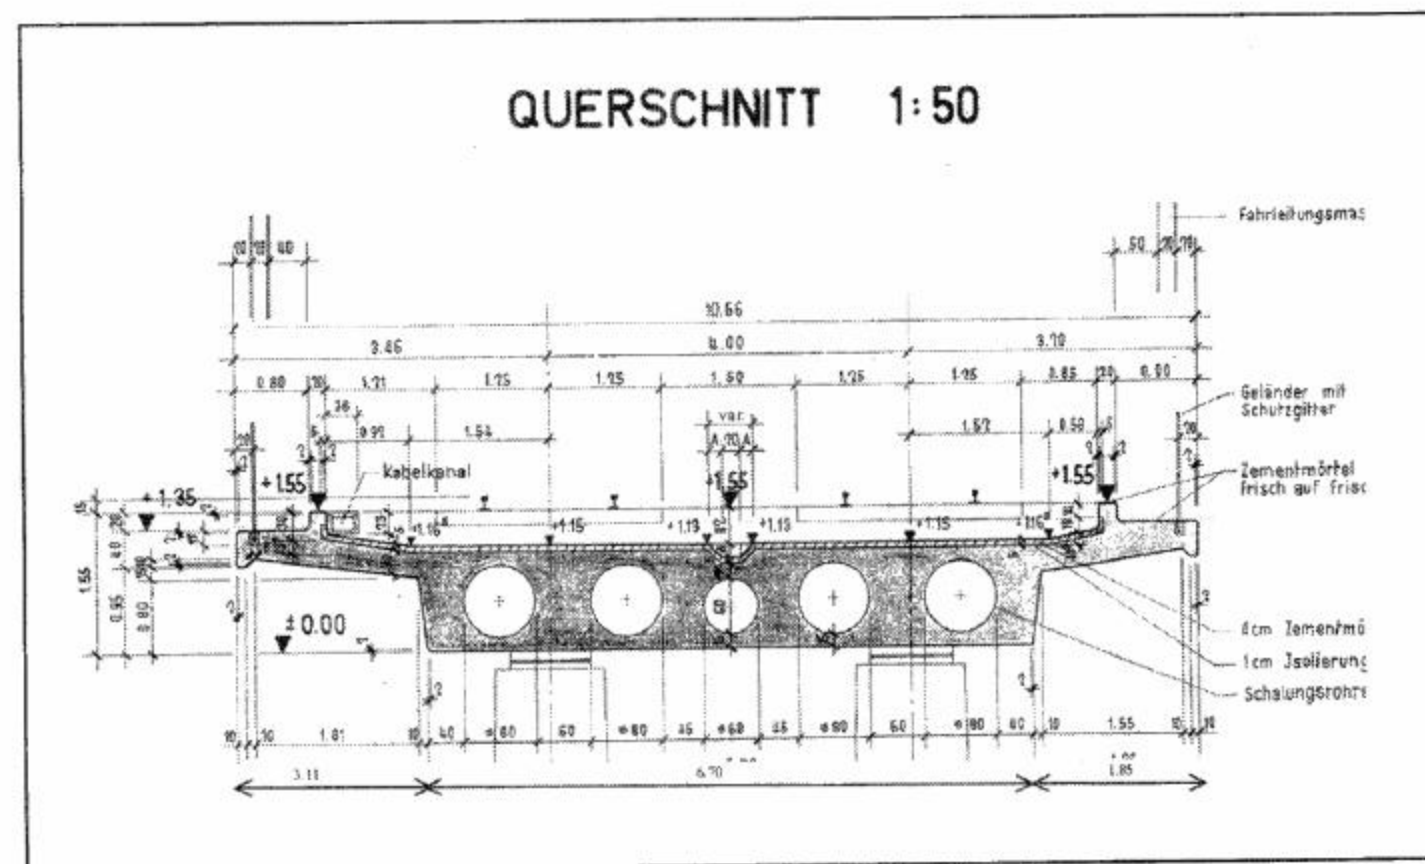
Cross-section of Concrete Bridge in Switzerland
